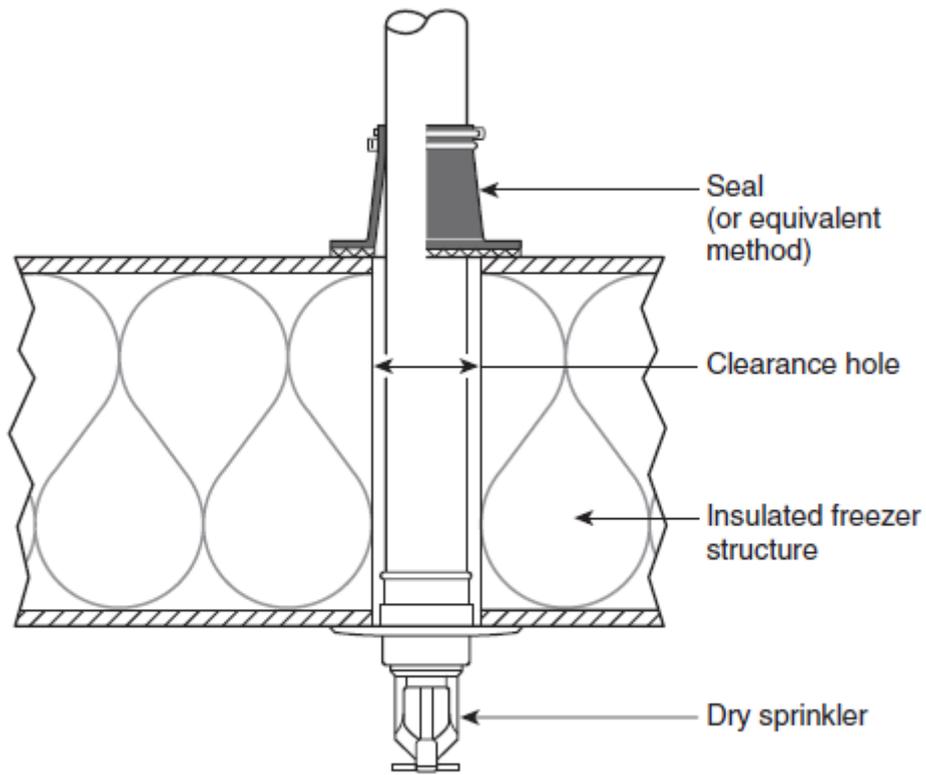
(a) Dry Sprinkler Seal Arrangement — Seal on Exterior of Freezer Structure.
